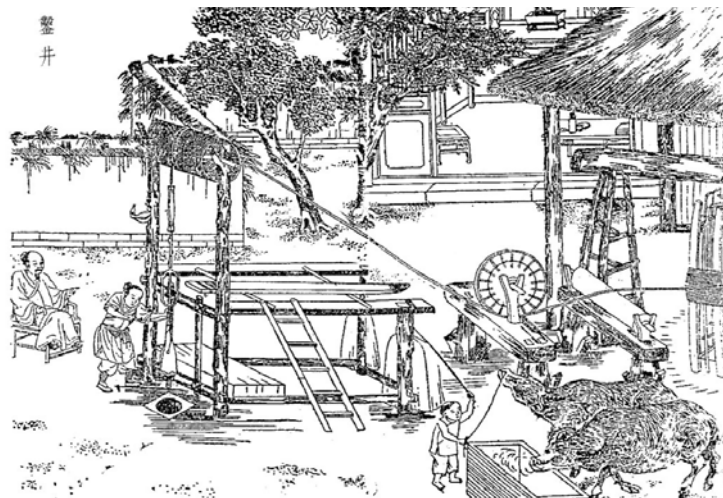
A cow-driven well-drilling rope wheel [21]
